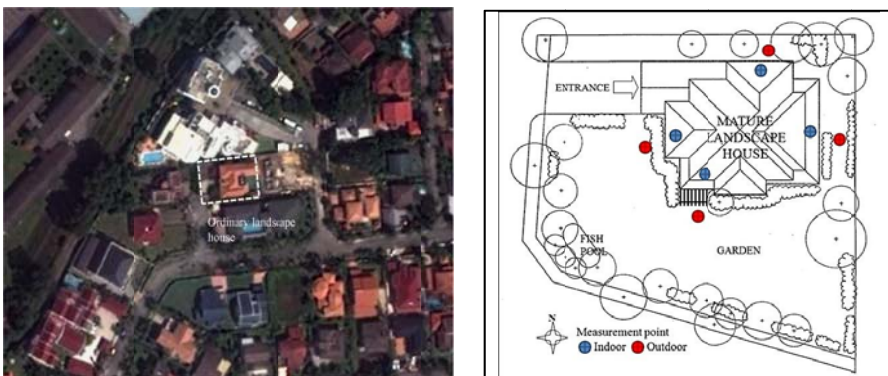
Location plan (left) and landscape plan (right) of the mature landscape house
